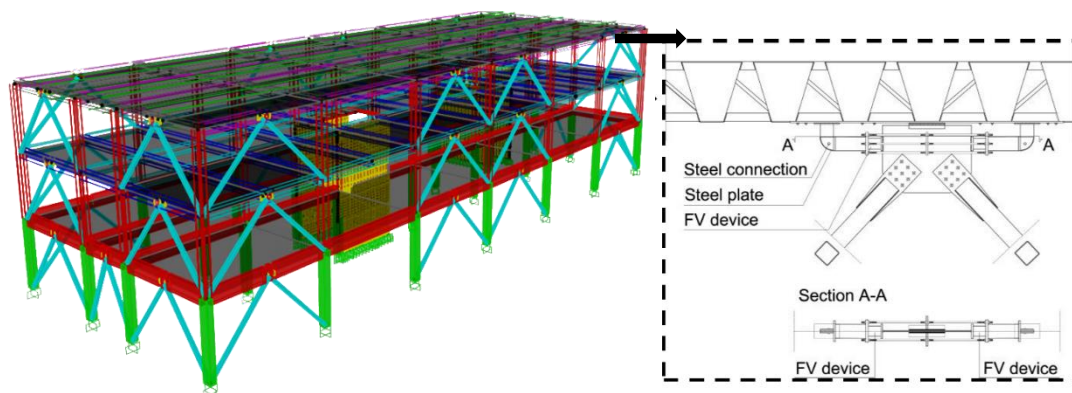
Finite element model of the structure, including the dissipative bracing system and installation details of the latter.
